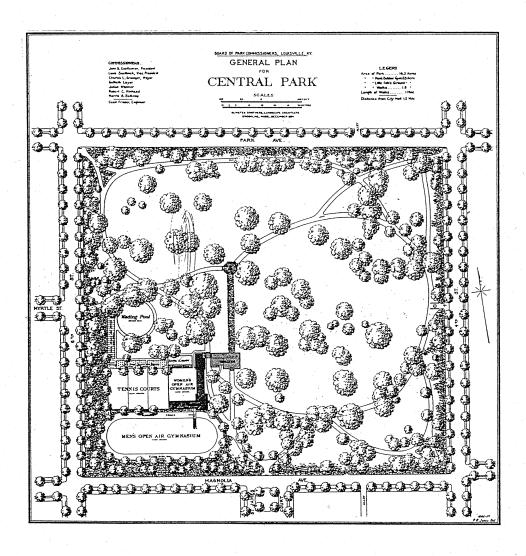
General Plan for Central Park, Board of Park Commissioners, Louisville, KY, Olmsted Brothers, Landscape Architects, Brookline, Mass., December, 1904. Courtesy Beveridge collection.
